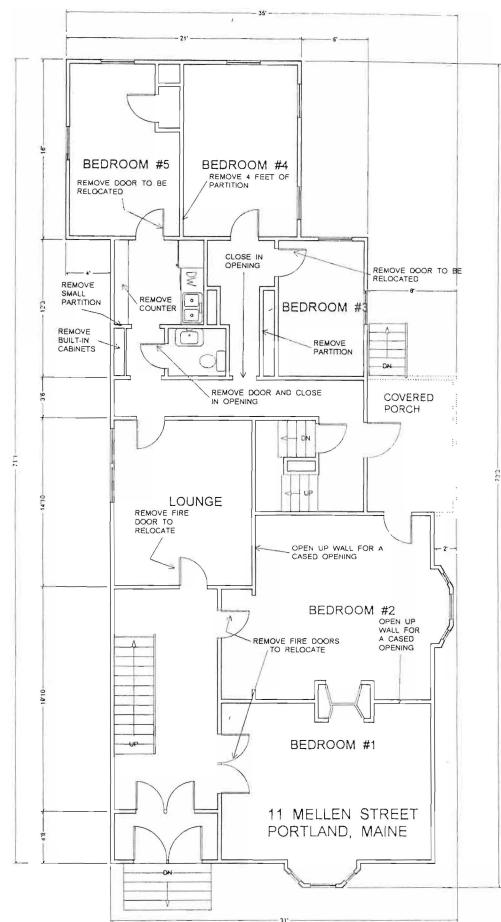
EXHIBIT "A" FIRST FLOOR PLAN "AS IS"
